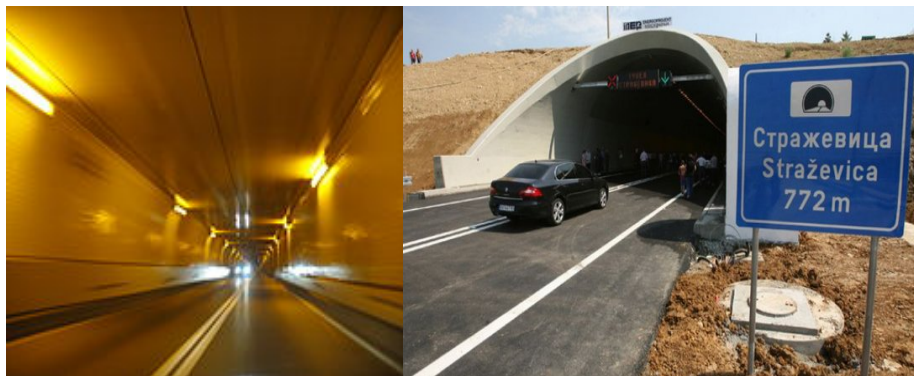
The entrance at the Straževica tunnel (right) and its inside look (left) (Figure source):
